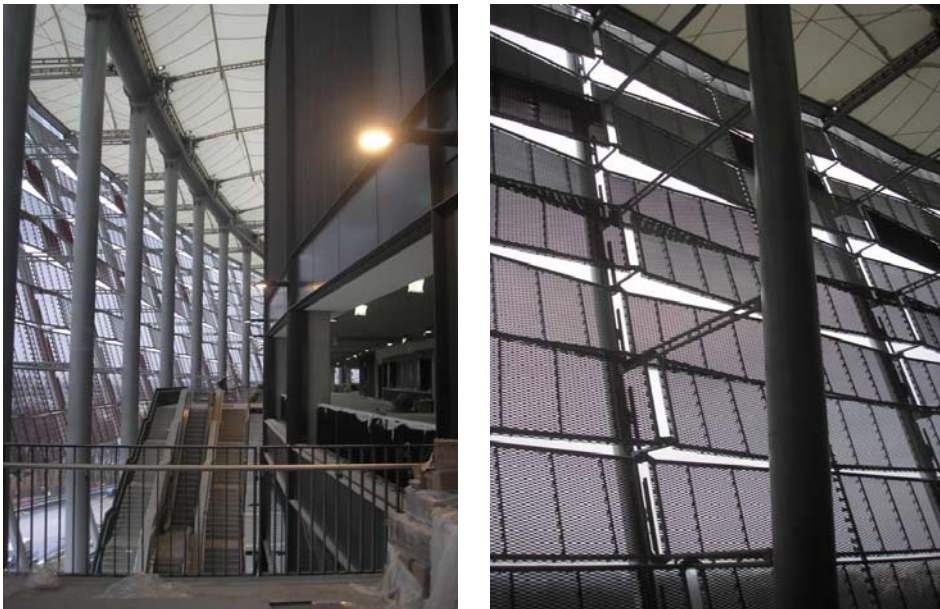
Cascade stairs between the bearing structure and stands; wind-proof fixing of the stay, which supports the façade
